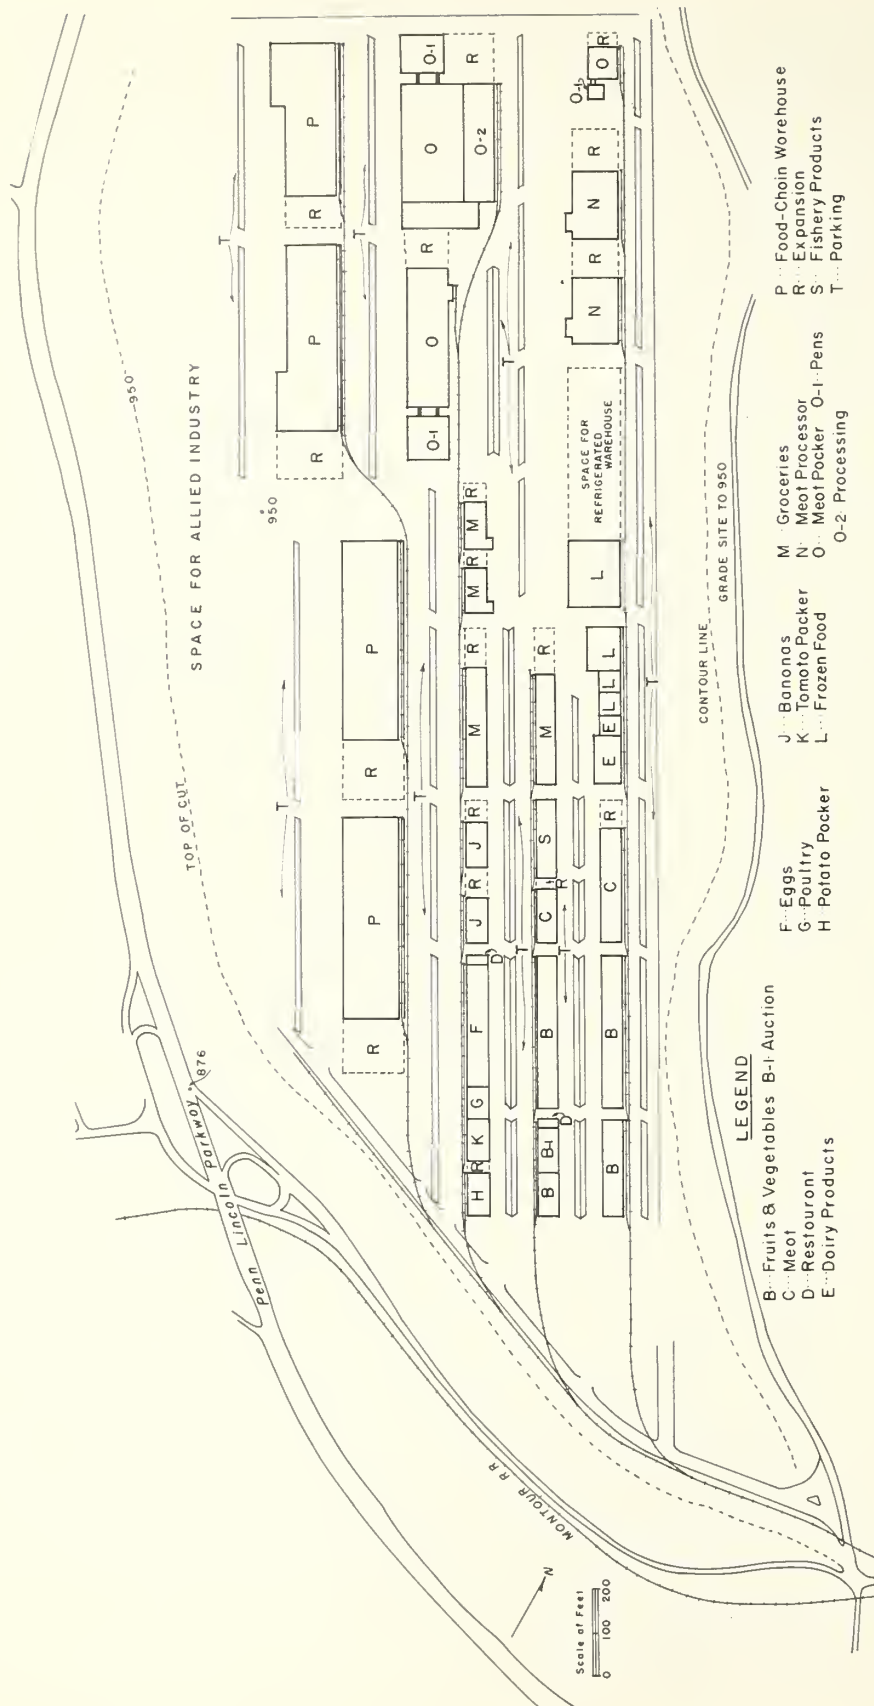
Arrangement of proposed facilities on the Moon Township site.
